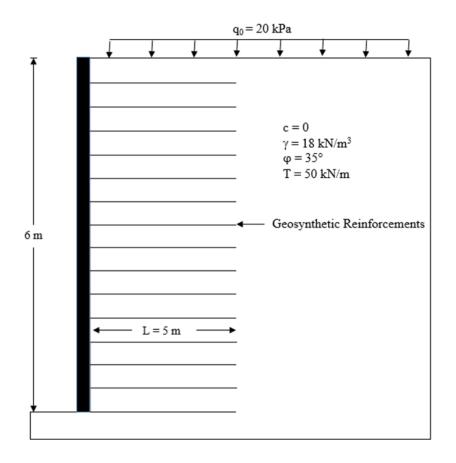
Schematic of Geotextile Reinforced Soil Wall
